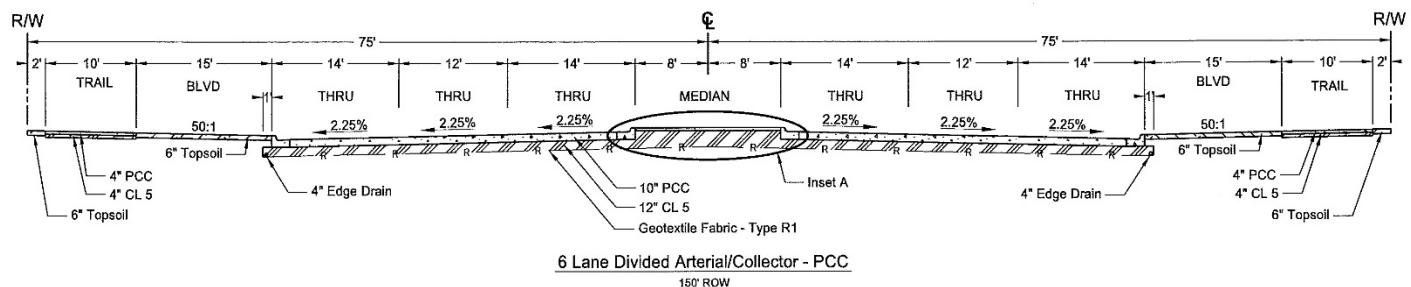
F: 6-Lane Divided Arterial/Collector Typical Section
